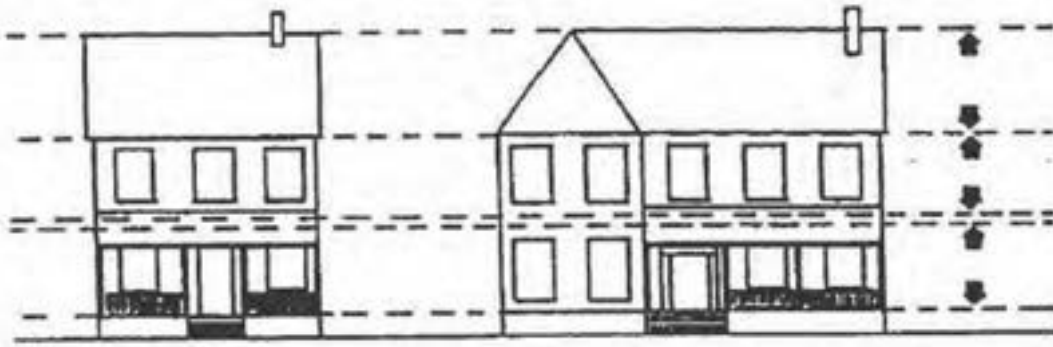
Floor to ceiling heights on new buildings should be compatible with the surrounding buildings. See Guideline 14.1.5c.
